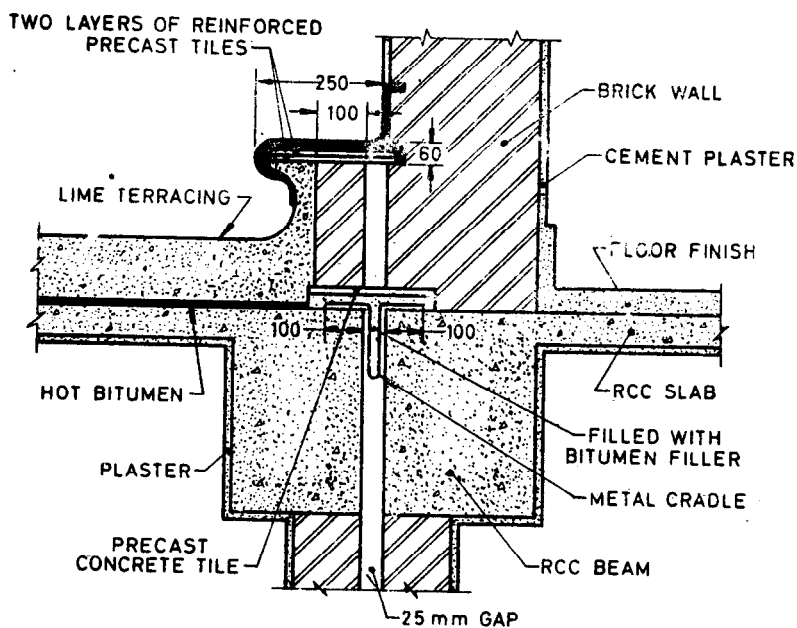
TYPICAL DETAILS OF EXPANSION JOINT AT WALL AND ROOF JUNCTION
